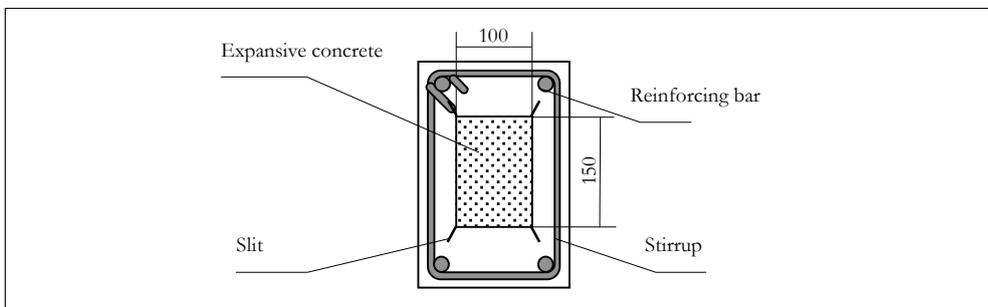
Cross-section of specimen, in which expansive crack was artificially induced using expansive concrete.
